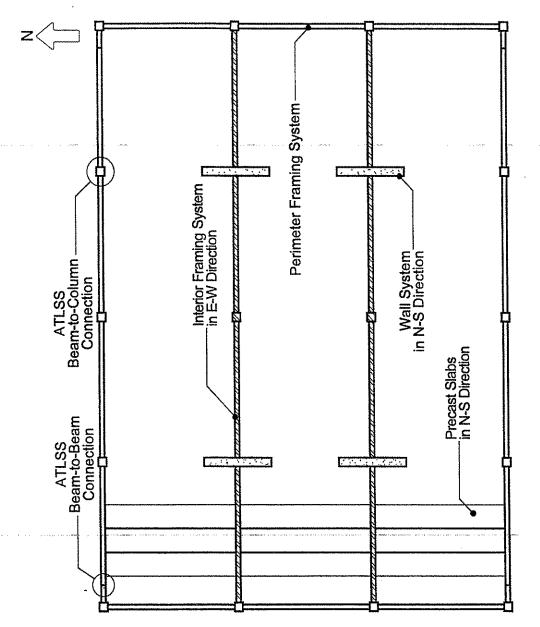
Typical Floor Plan for a Structure Using Three Dimensional APC System (with Wall System)
